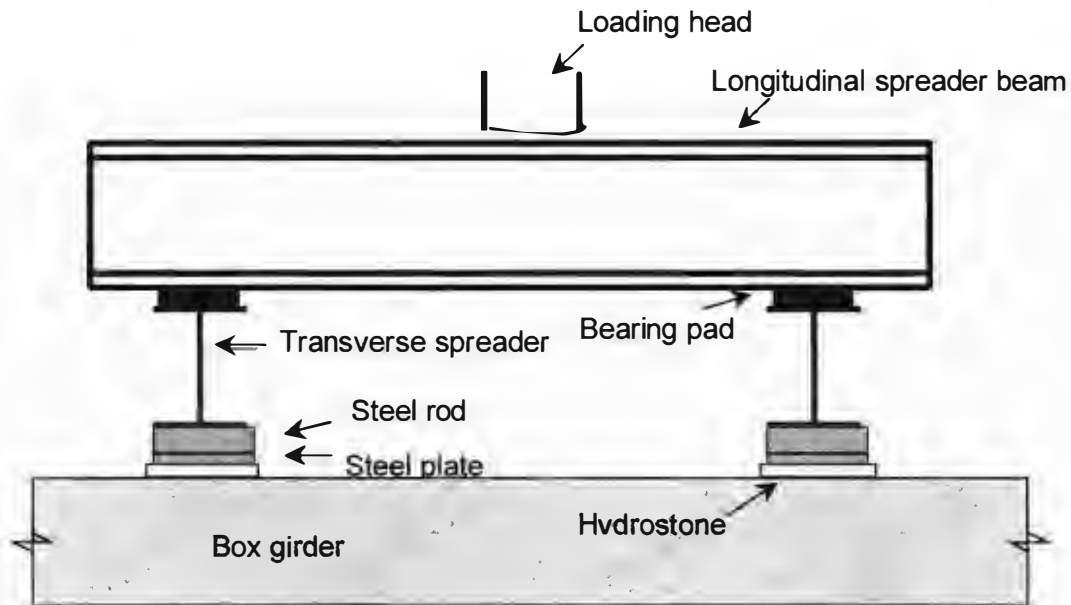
Detail of loading setup for flexure-dominated specimens (elevation)
